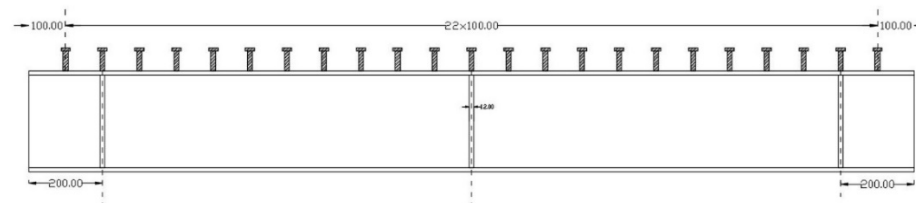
Elevation view of the truss connections of the girder with vertical steel webs (mm).
